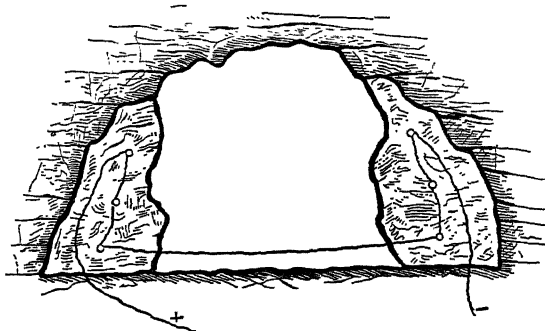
METHOD OF SHOOTING SIDE-CUT HOLES IN TUNNEL-HEADING.
